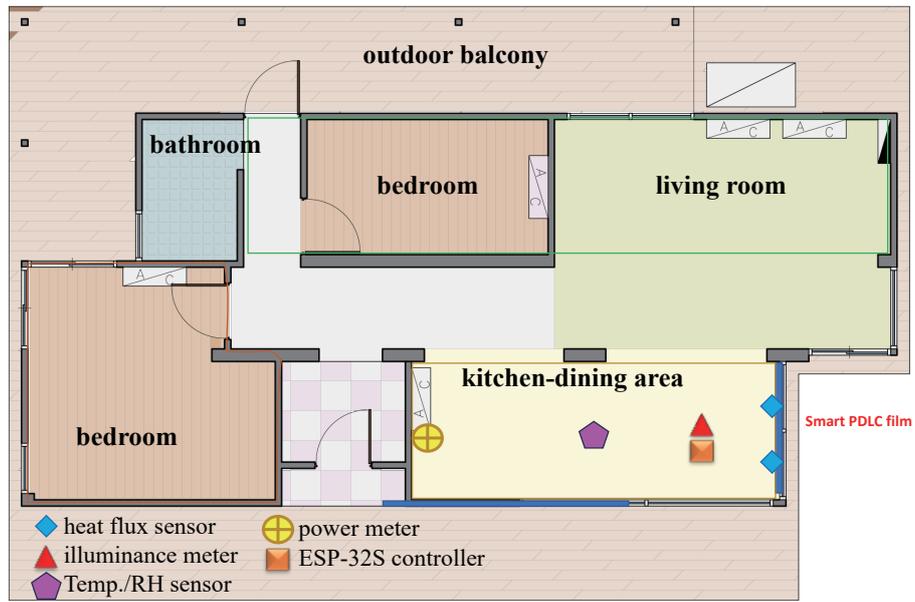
(Color online) Indoor space layout and measurement facilities.
